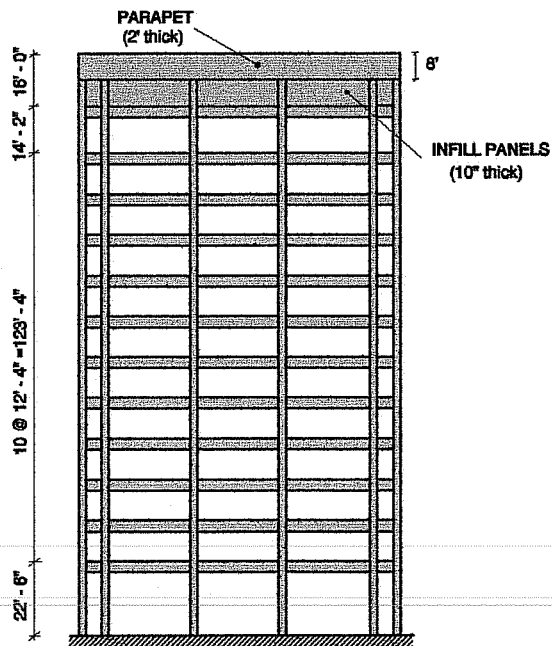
Typical elevation in the short direction of the 12-story building.
